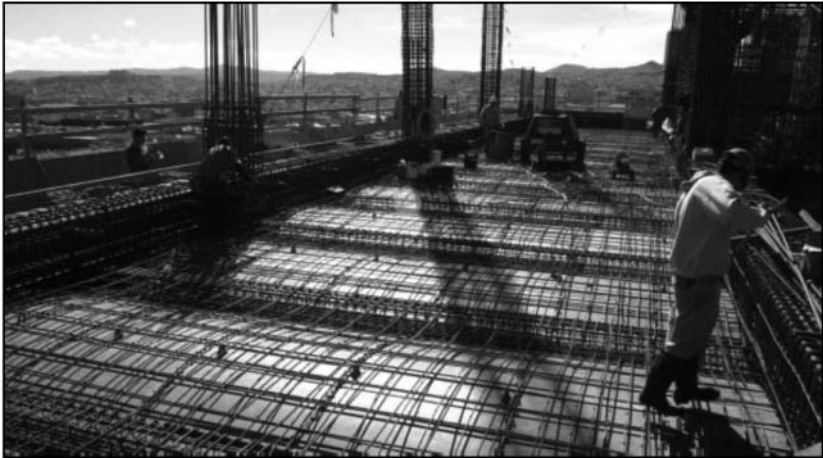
Wave slab reinforcement: Because it could more readily follow the soffit profile, prestressing strand was used as bottom reinforcement. At the deepest portion of the slab, the main reinforcement was detailed as a beam with stirrups.
